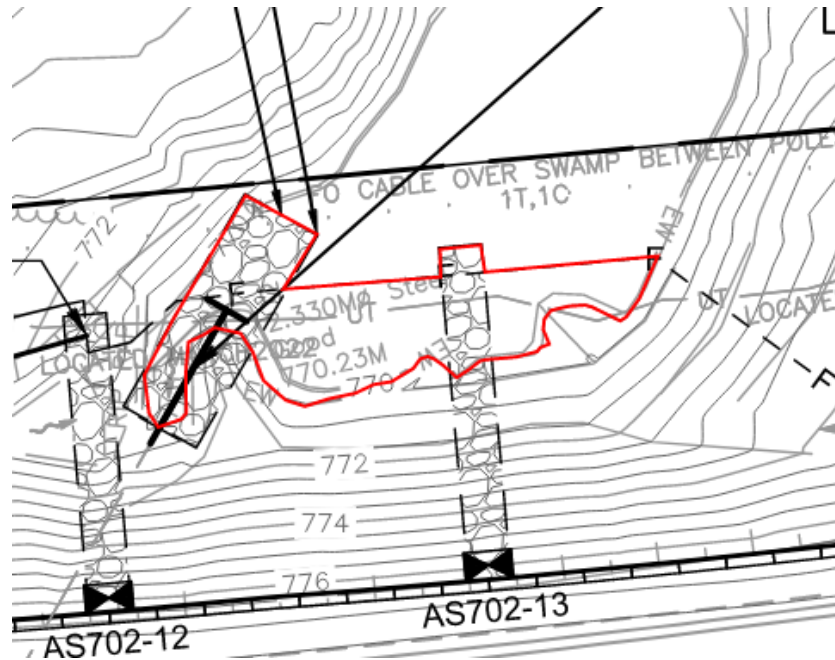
Snip taken from Drawing R3-375-702 showing the extent of wetland infill (shown in red).
